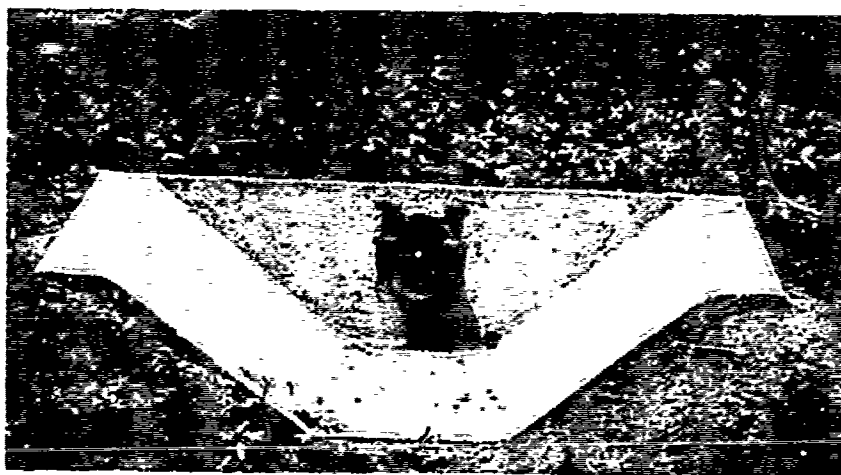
Tee-type outlet with flap gate and concrete discharge apron
